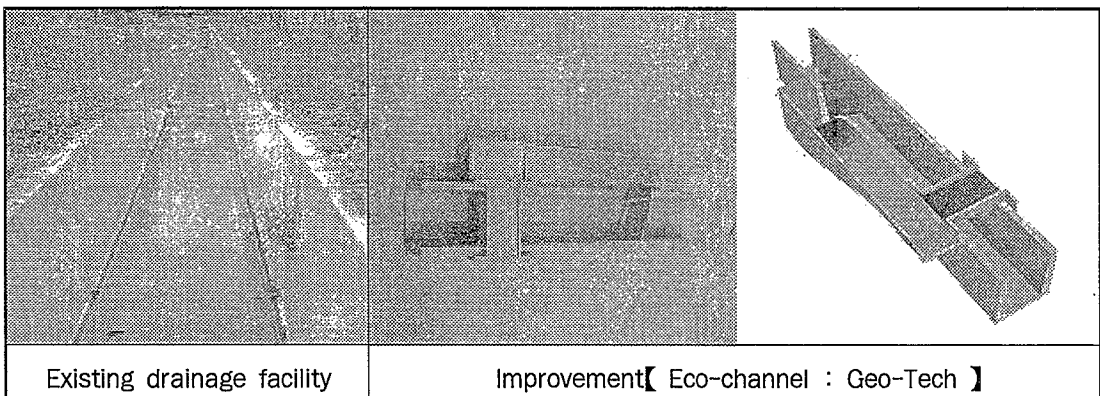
Existing drainage facility and improvement to Eco-channel type drainage facility.
